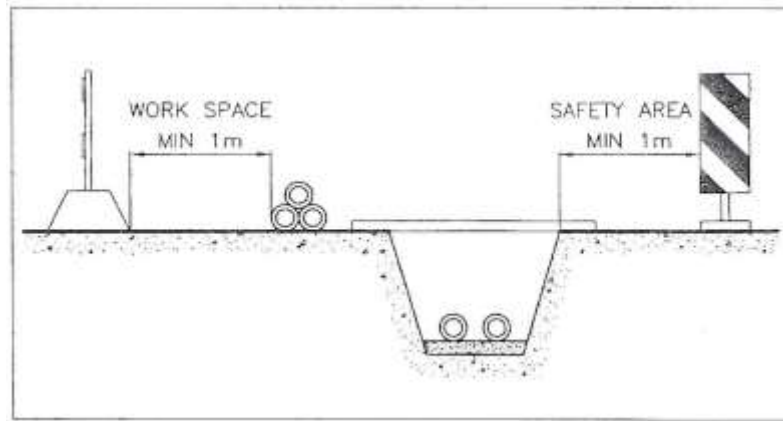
Pipework Installation Working Space (image courtesy District Heating Handbook, EDHPMA)
